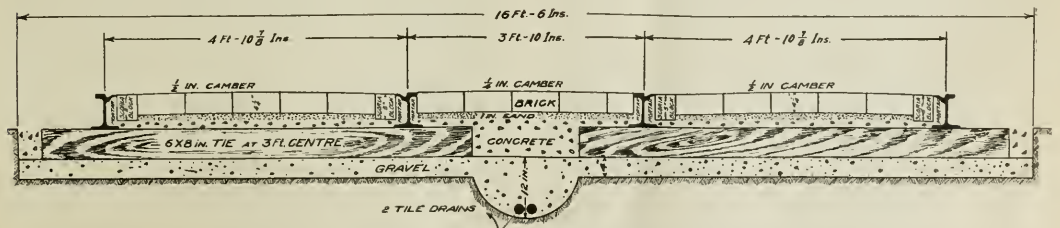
Brick with $6\frac{1}{2}$ -in. Girder Rail, 1893 Construction
